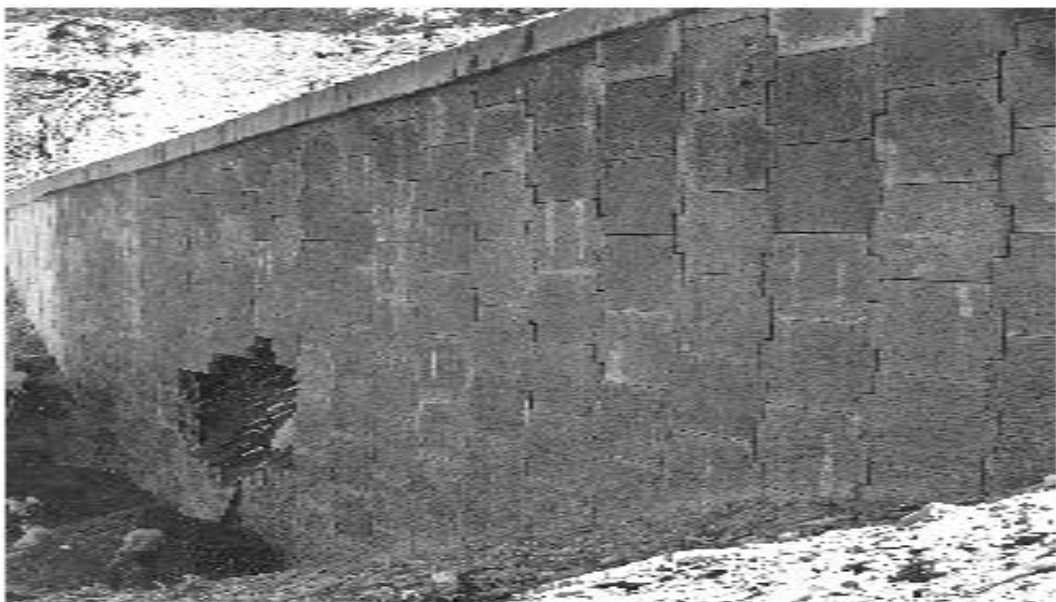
Failure of a reinforced earth retaining wall (Koerner, 1998)
